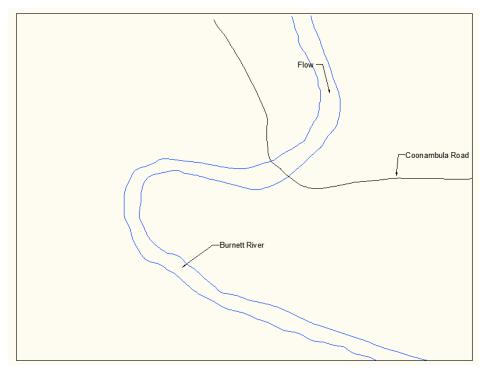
The current horizontal alignment of Jack Parr Bridge.
